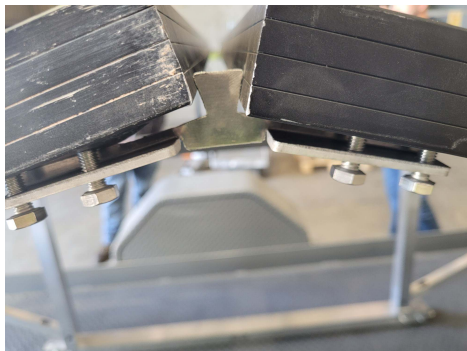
Underside solar panel at top ridgeline after 1500 lbf test load. Solar panel has started deforming at bolts and lifting off the attachment
